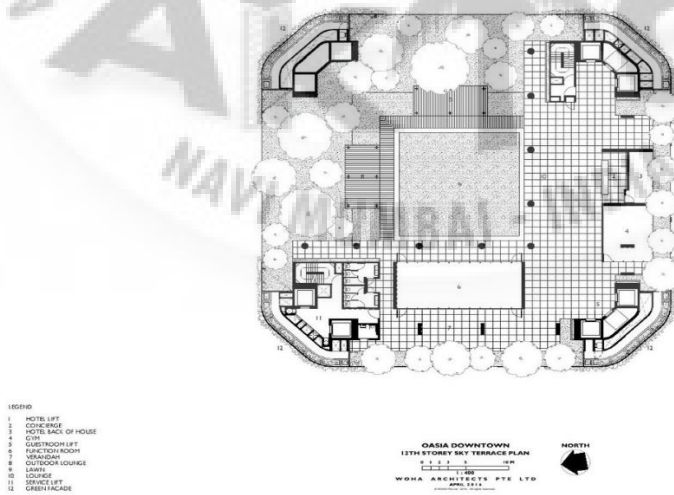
Oasia Hotel Downtown plan (Source – Arcdaily)
